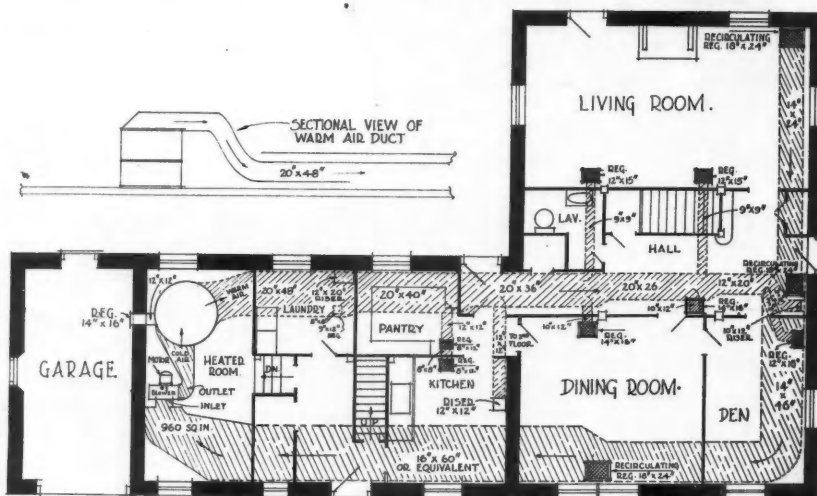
First Floor Plan of a 15-Room, Basementless Residence Which Was Successfully Heated with a Warm Air Furnace. In this plan the warm air ducts are fully indicated.
